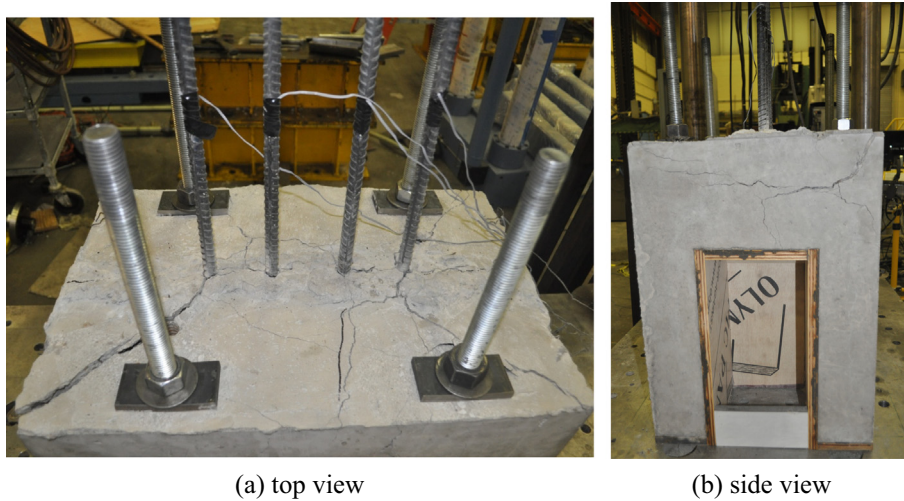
Cracked concrete surface following pull-out failure.
